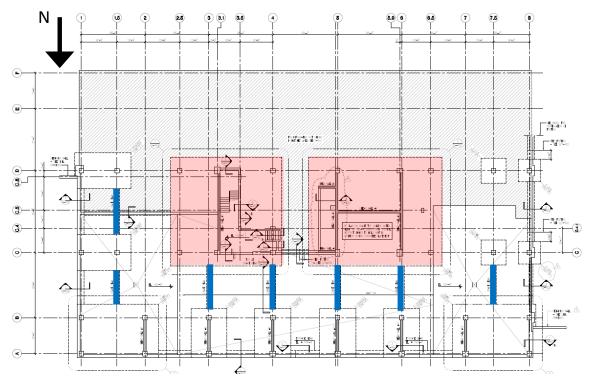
Foundation Plan (Level P0) Showing 48" Thick Mat Foundations Shaded in Red (Source: Cagley & Assoc. Drawing S-200)
